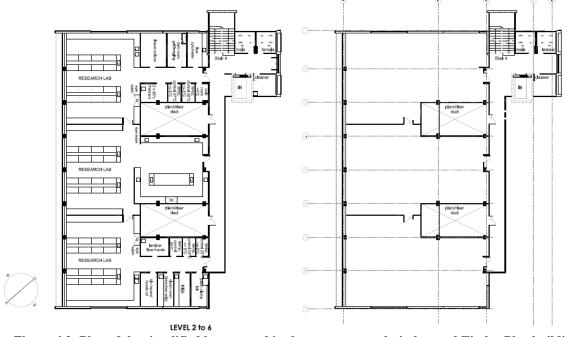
Plan of the simplified layout used in the concrete, steel, timber and TimberPlus buildings.
